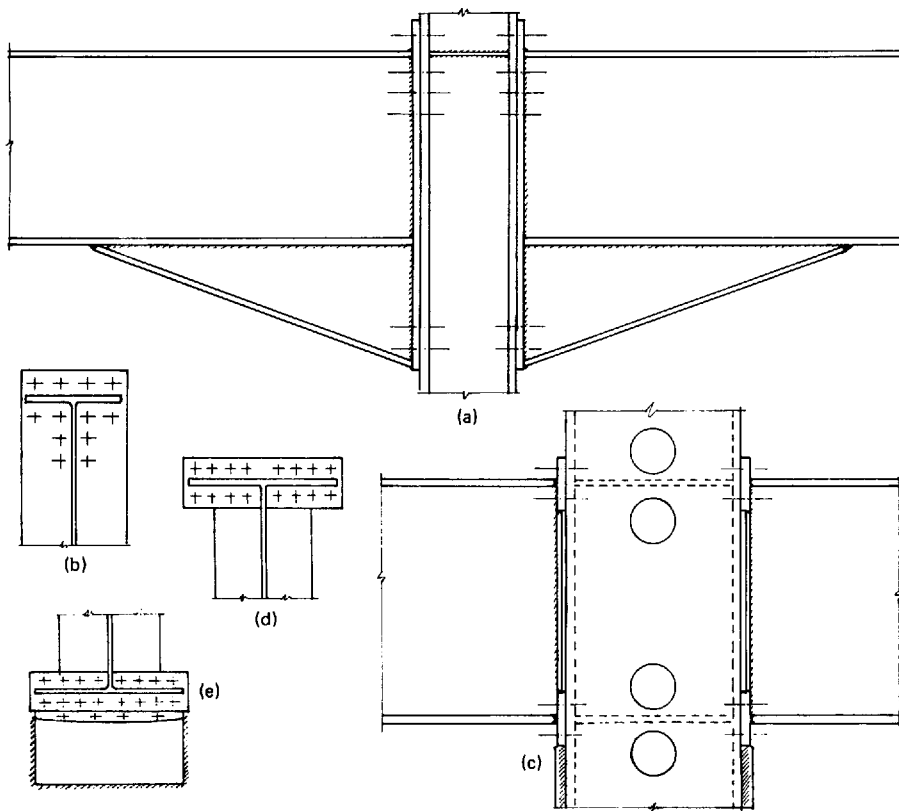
Rigid beam-to-column connections in heavy construction. (a) Using haunches; (b) bolt pattern for (a); (c) box column and plate girder construction; (d) bolt pattern for (c); (e) radiused pack for torsionally stiff girder
